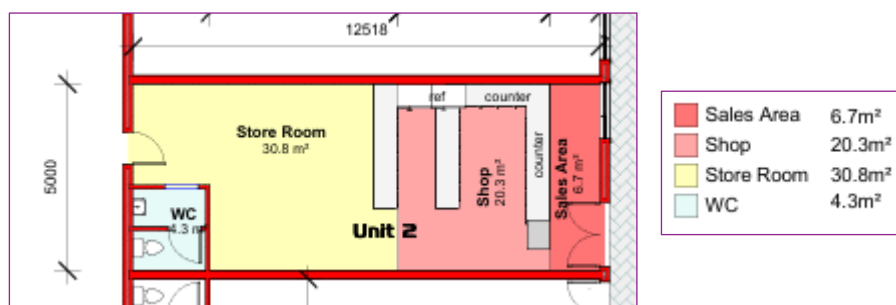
Detail layout of the proposed liquor store on Erf 8427, George
